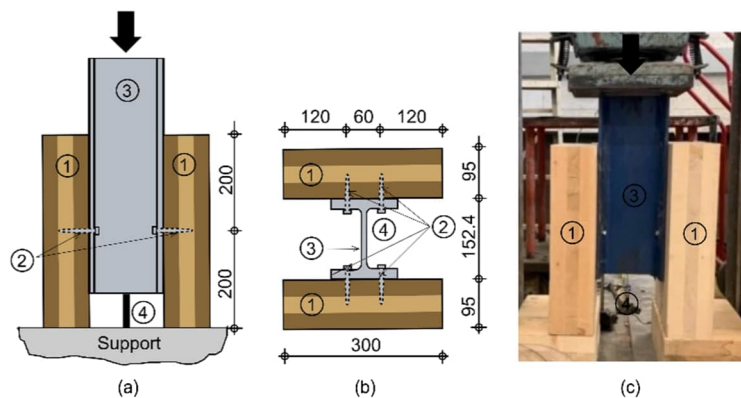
Specimens' details: a) schematic front view, b) top view, c) view of a test specimen (legend: (1) CLT panel, (2) screws, (3) steel profile, (4) transducer, arrow indicates reaction point)
